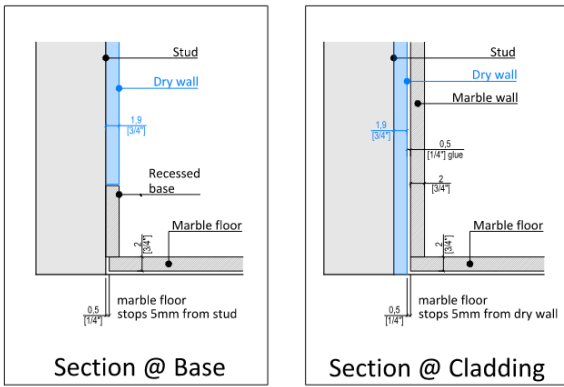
Base and Cladding Section Details Used to Verify Assembly Build-Up and the Dimensional Basis for Floor and Wall Stone Sizing: (A) Recessed-Base Condition; (B) Cladded-Wall Condition
